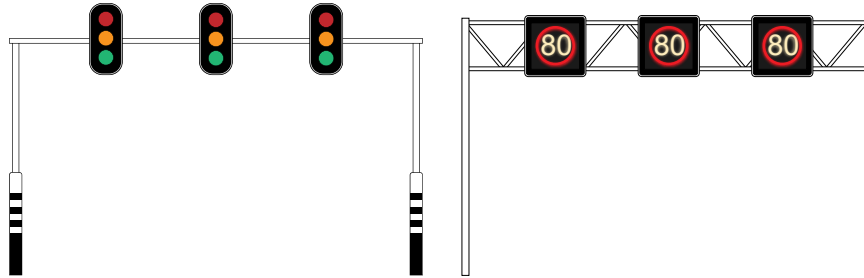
The traffic light construction has similar structural characteristics to the traffic gantry.
